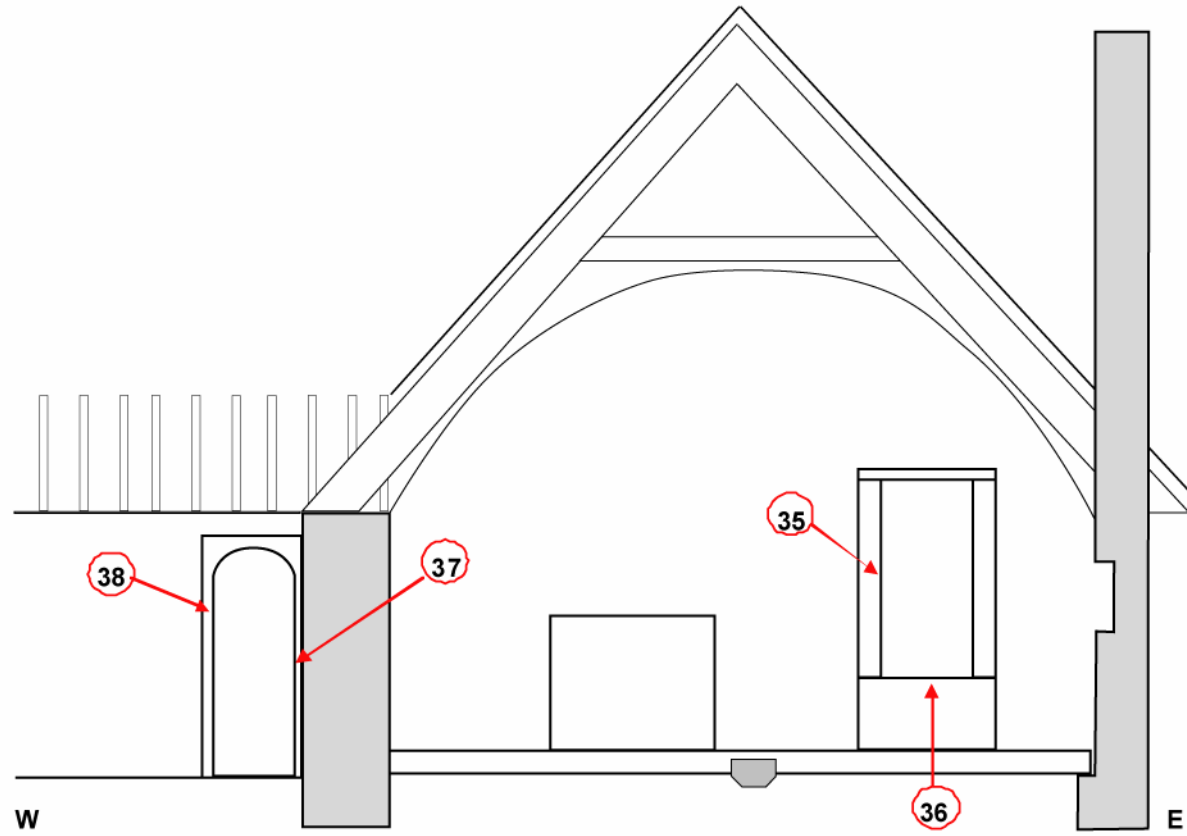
Section at attic level to show sampled door-frame timbers (after Marius Barran)
